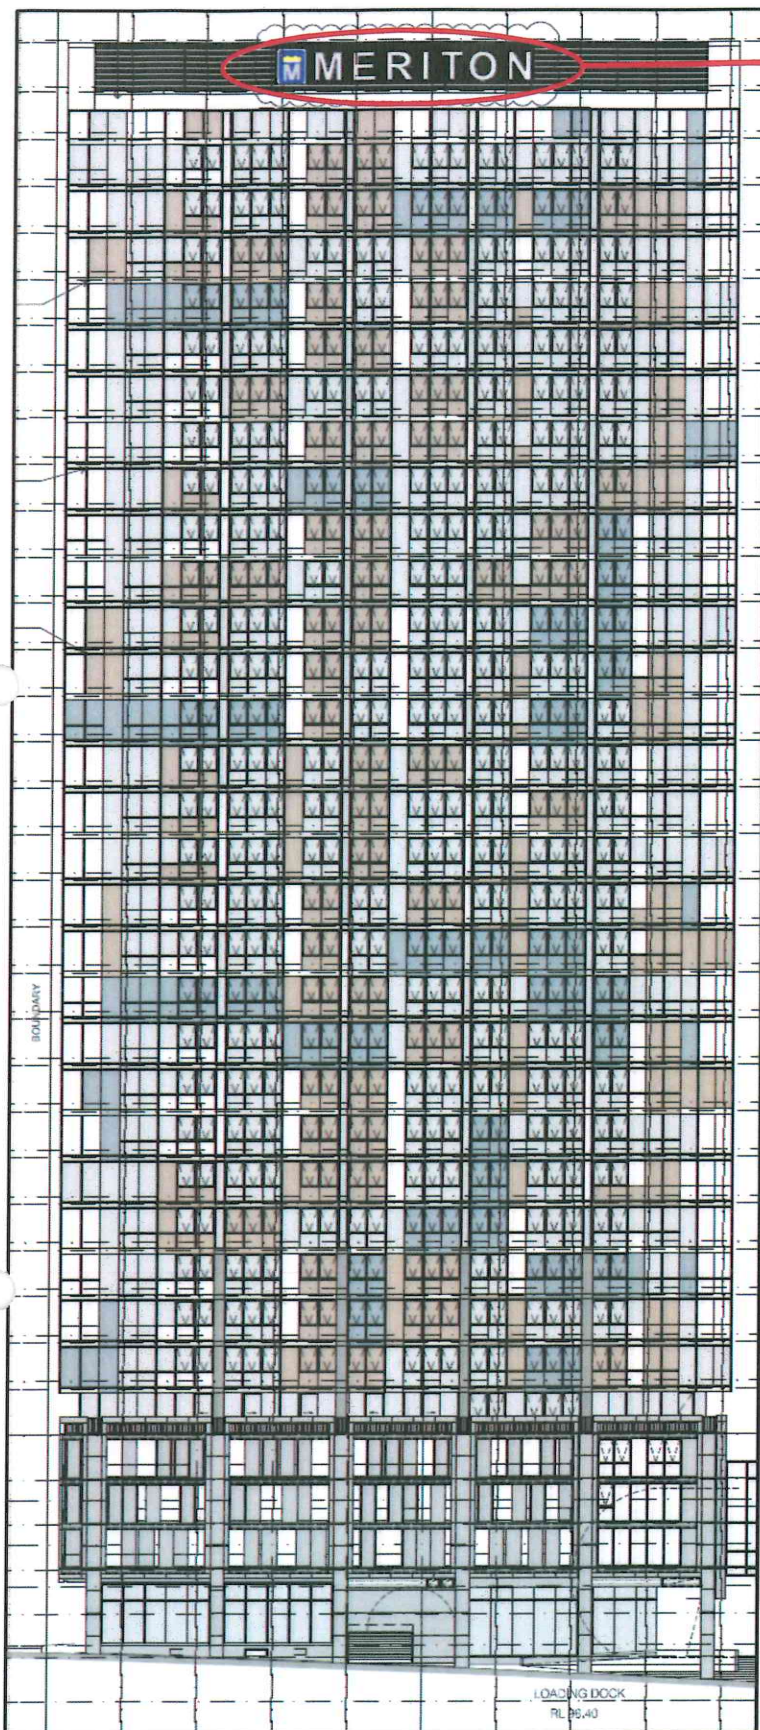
Proposed Sign 1 on southern elevation at Level 33
